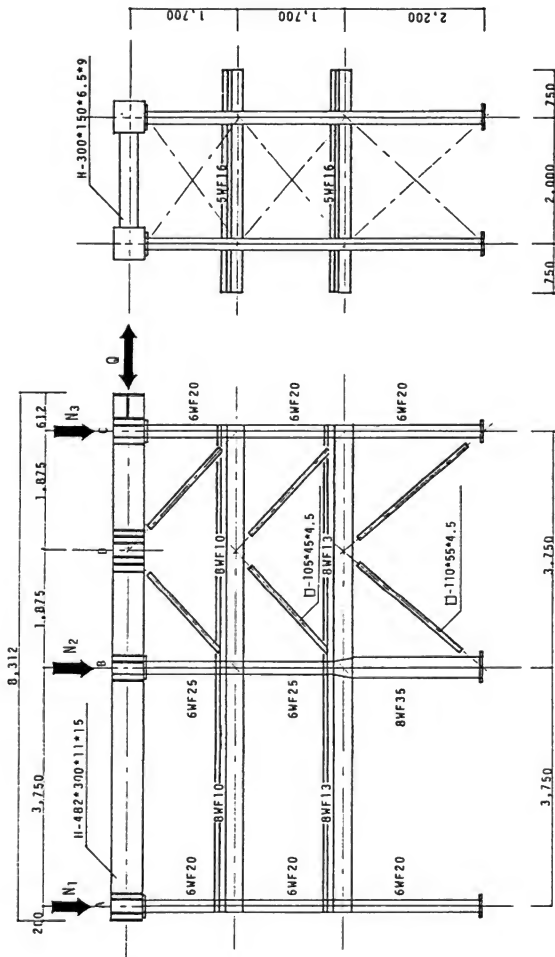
Test Specimen No.1 ,Static Test of Three Story Steel Planar Frames
